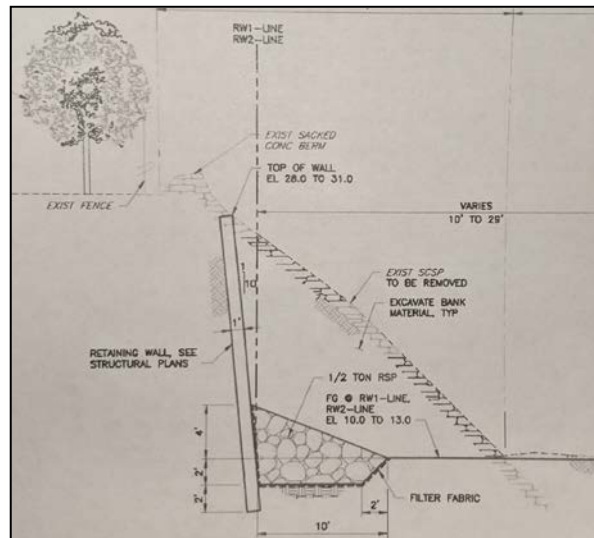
Construction plans showing existing sakrete and future retaining wall.
